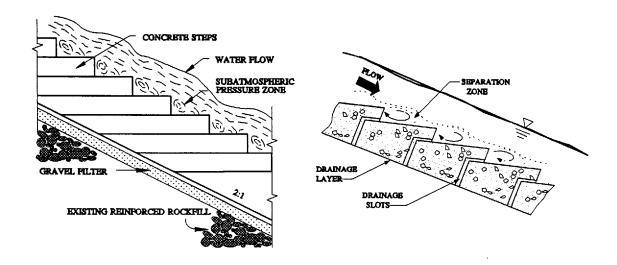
RCC embankment overtopping protection and wedge-shaped revetment block design developed by Pravdivets.
